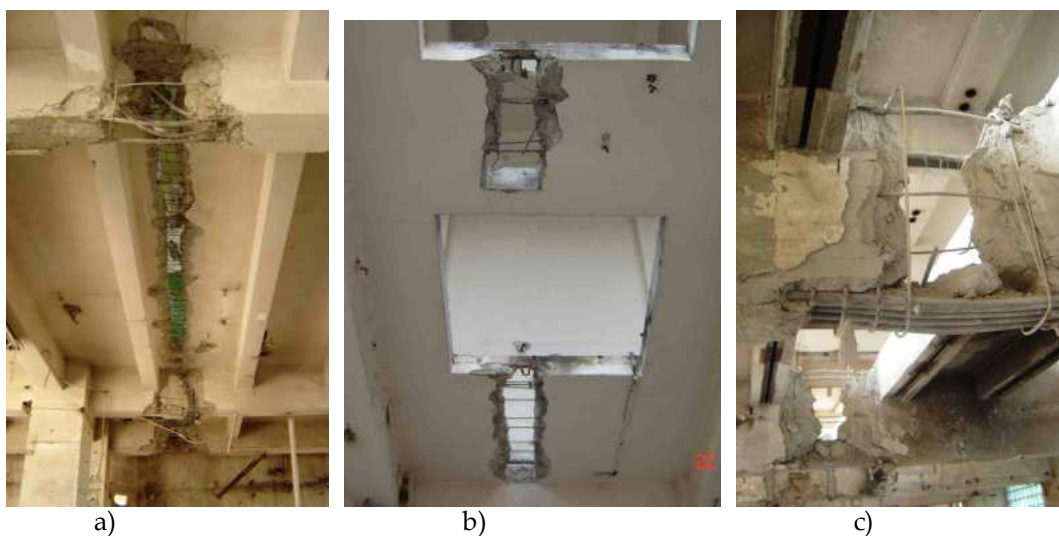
Concrete removal in preparatory works a), b) mechanical removal) and c) blast removal.
